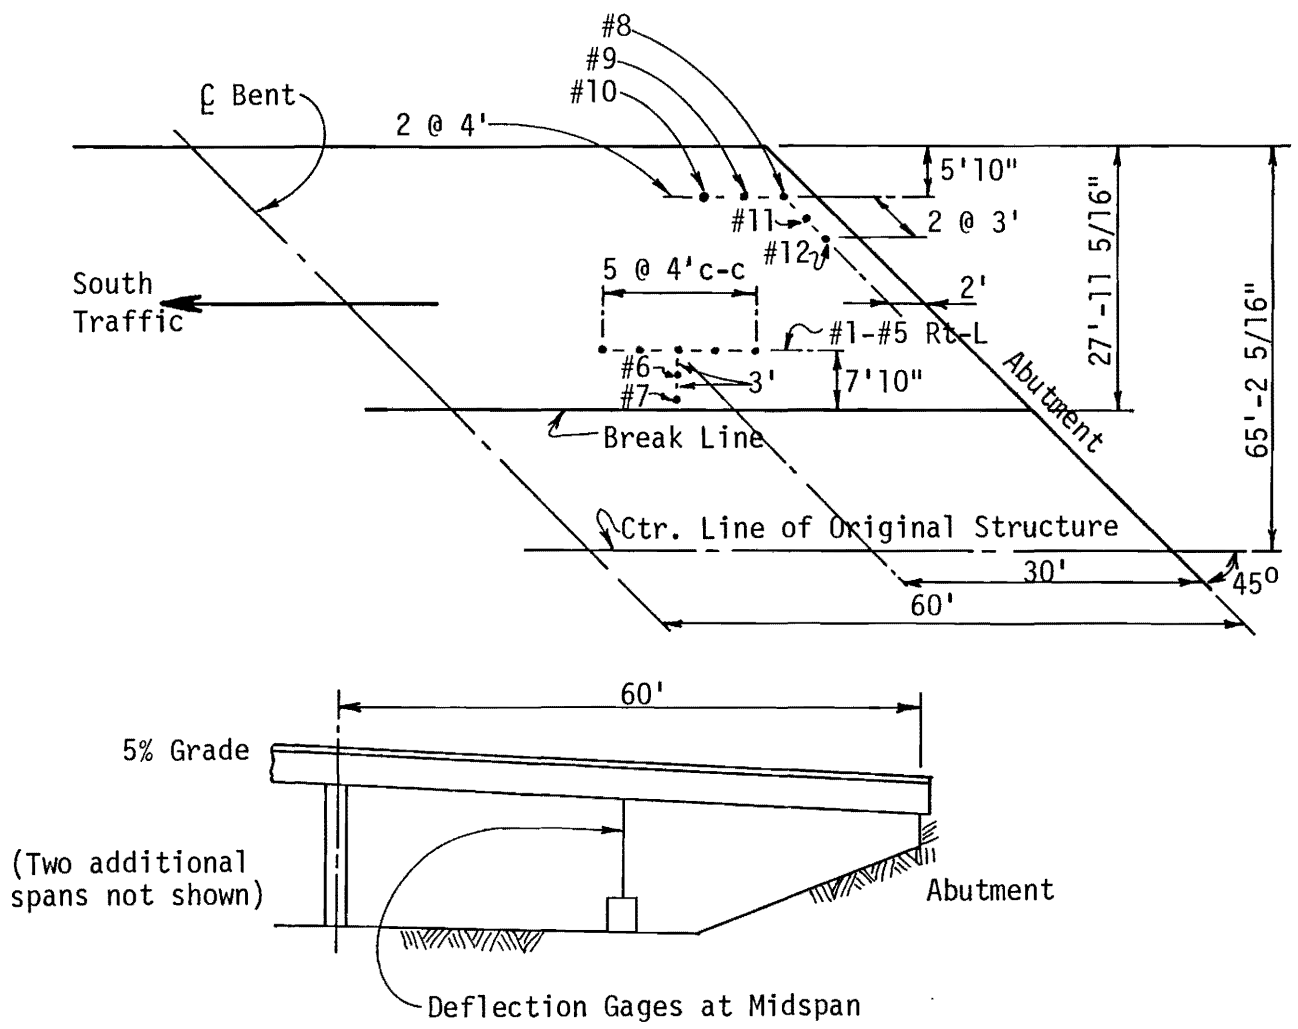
I-35 & Avenue D Bridge: Core Locations.
